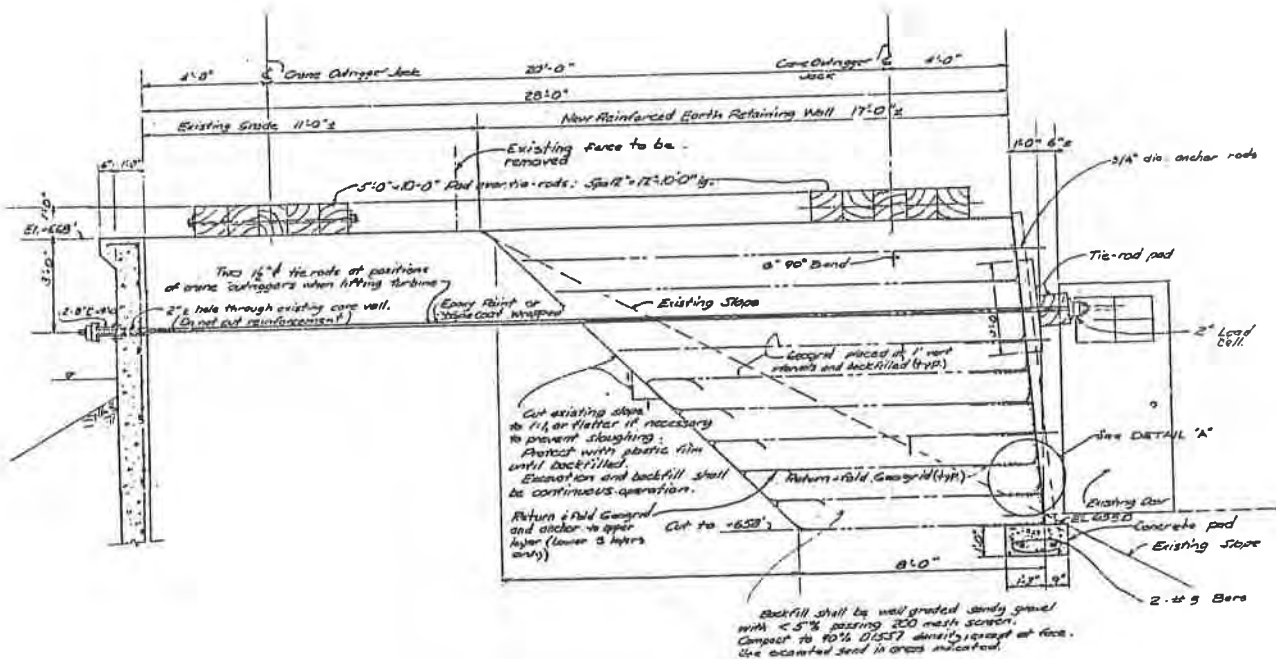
Final Design of Cascade Dam Reinforced Soil Wall
